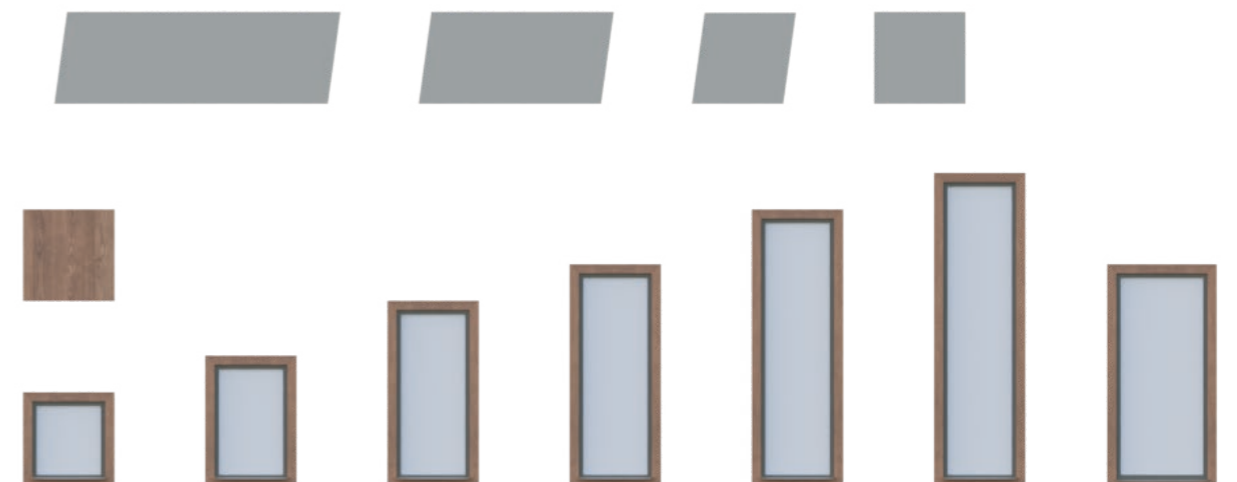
, Modular building blocks, Windows and concrete blocks for the concrete base.
